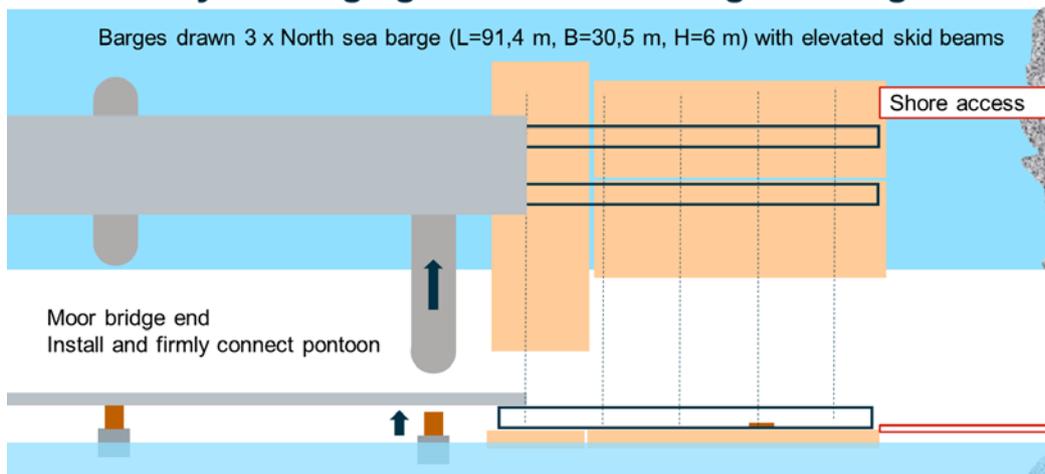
Completion of joining 100 m bridge girder, shifting in temporary mooring and installation of pontoon
